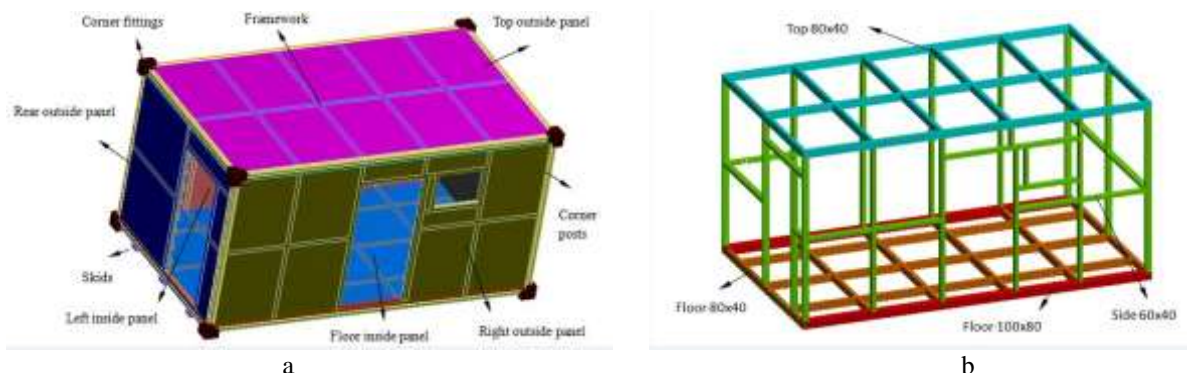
CAF35 shelter model: a - structural components, b - structural framework
